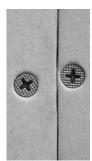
An example of two gypsum boards connected with screws to a wooden frame. The pictures demonstrate how typical connections are not perfectly straight.
